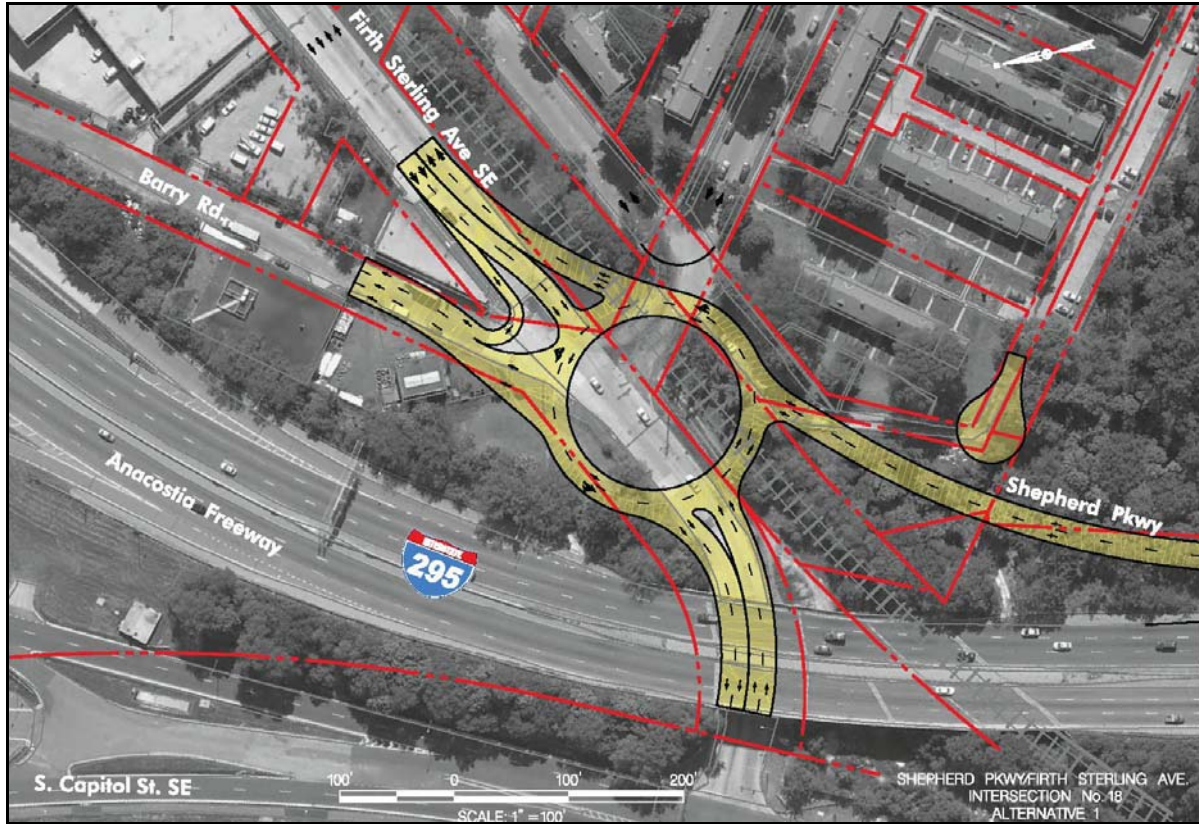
Firth Sterling Avenue/West Campus Access Road Intersection Roundabout Configuration (Alternative B) Considered but Eliminated from Detailed Study
